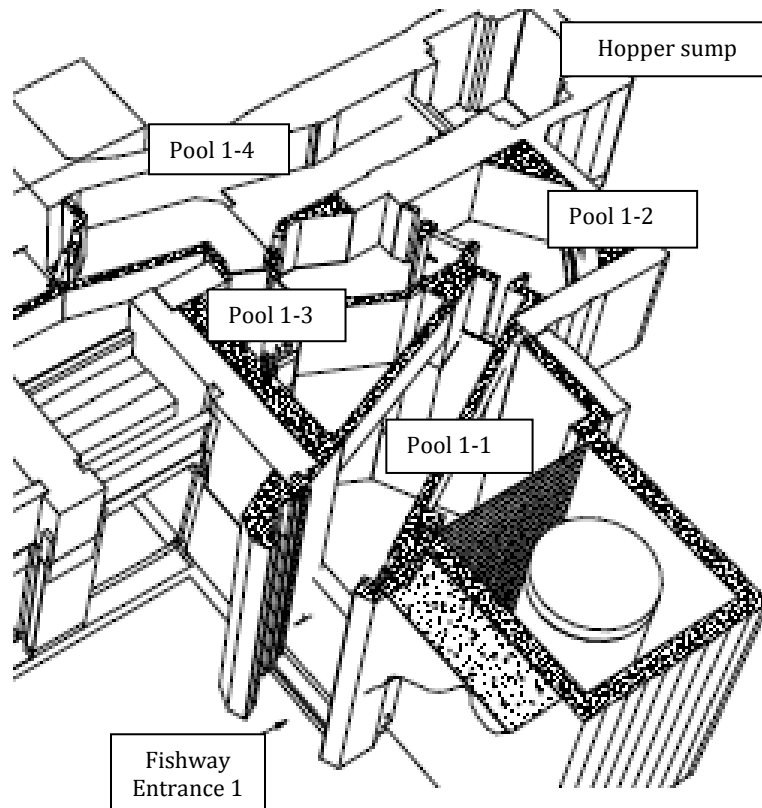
Merwin Sorting Facility ladder entrance and pool configuration.
